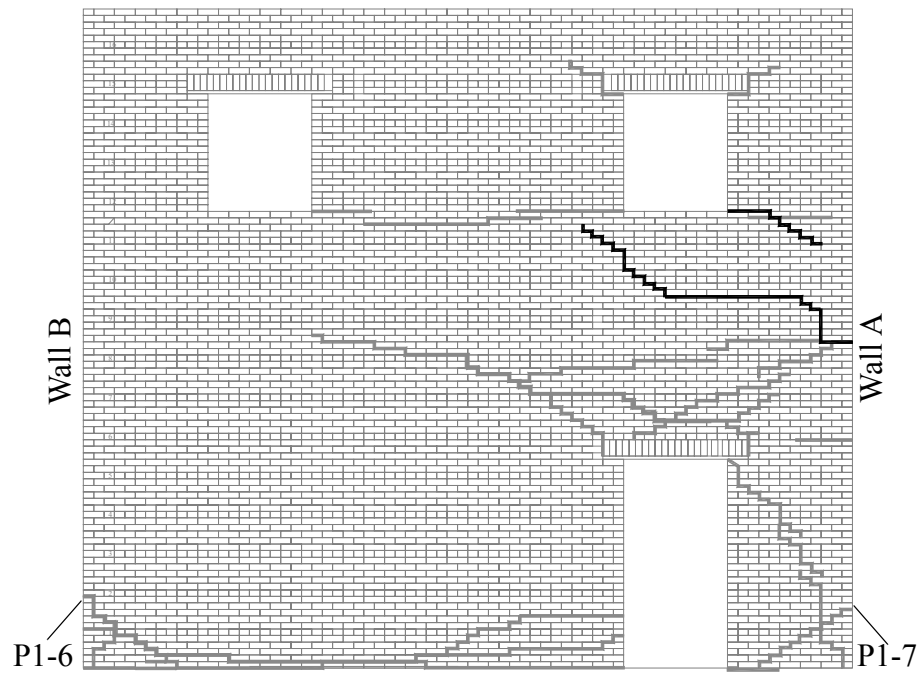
Crack pattern of Wall 1 following Test Run 26.
